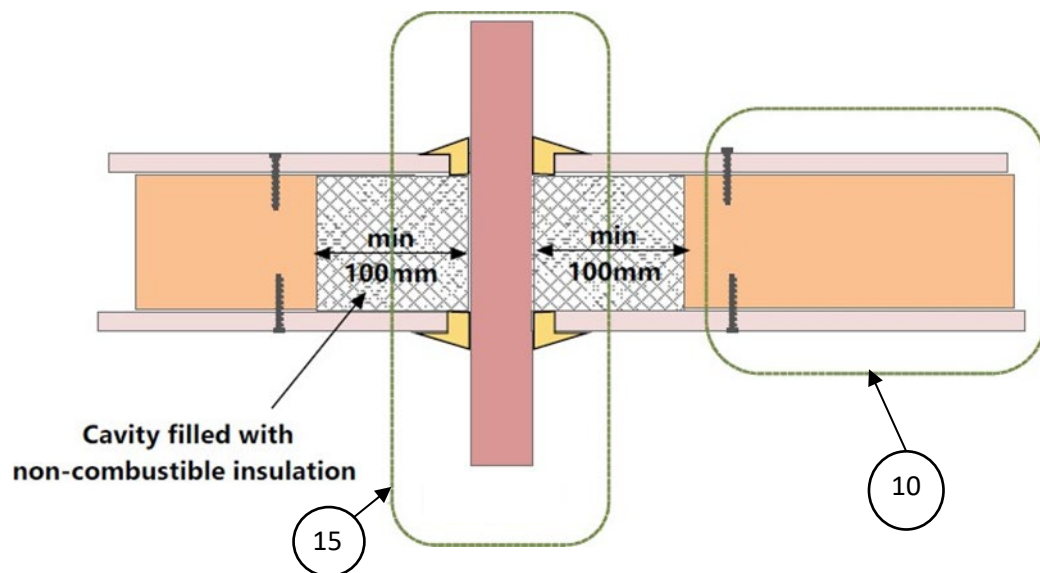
Insulated cavity service penetration through massive timber construction – Plan view
